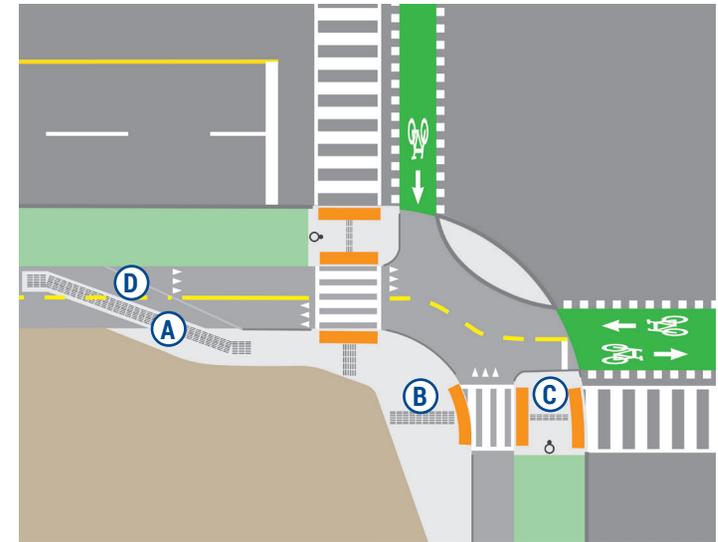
Standard protected corner showing directional TWSI at transition from MUP to separated facilities where pedestrians do not have straight path of travel (not preferred)
